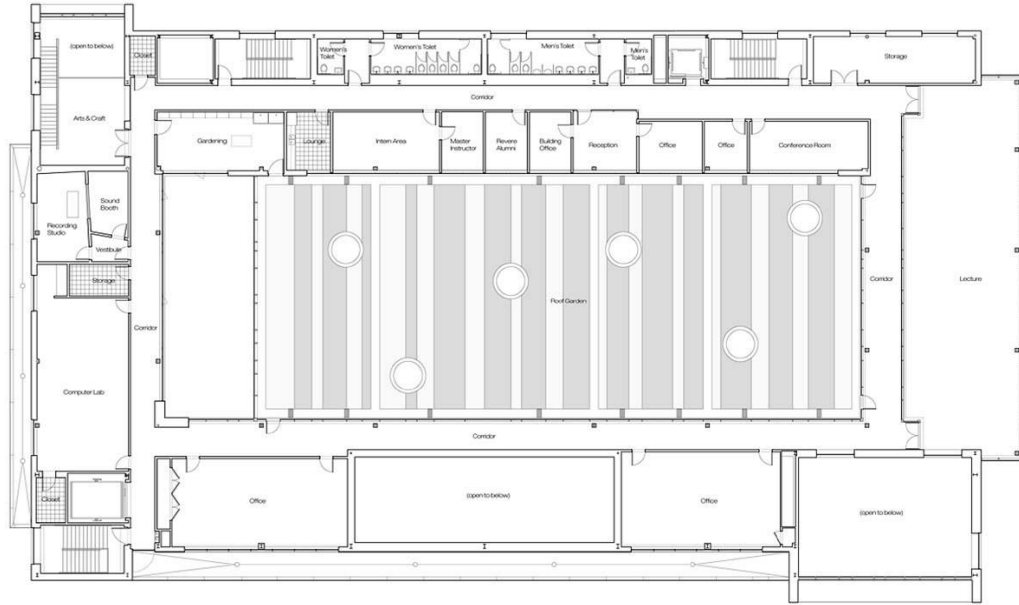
Third Floor Plan at Gary Comer Youth Center
